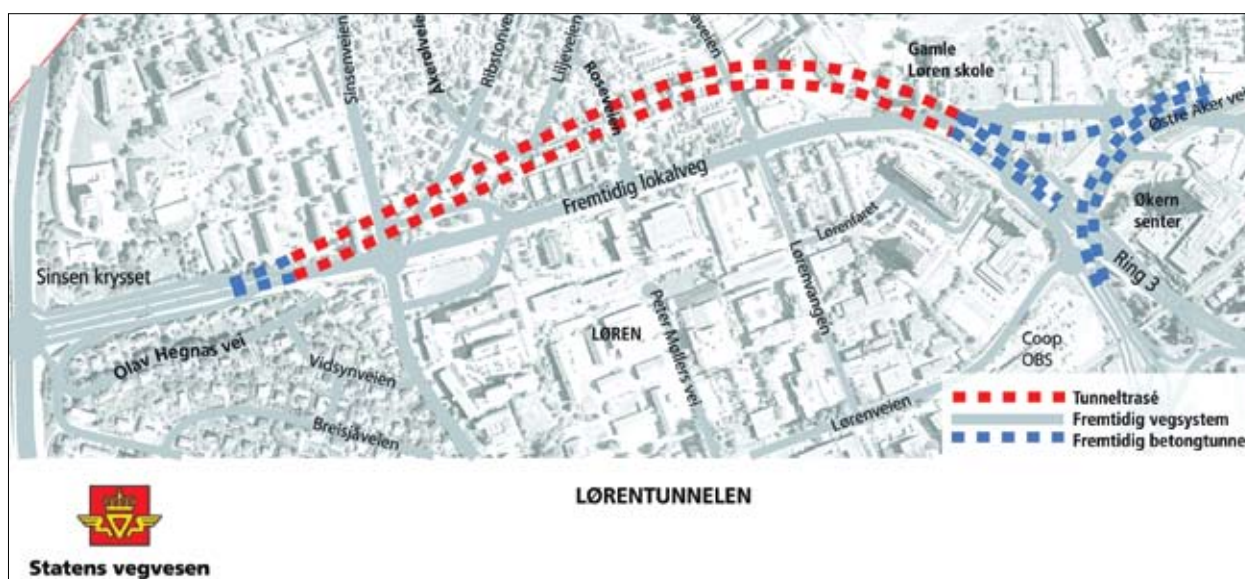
Ringroad 3 has been under reconstruction during decades. Now the challenging Løren section is on including tunnelling.
